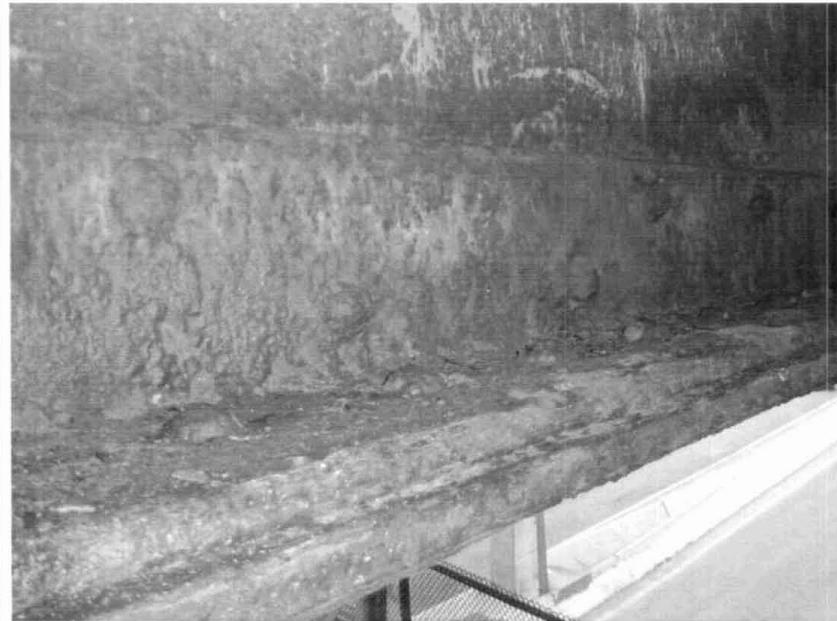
Heavy rust with section loss in the bottom flange angle and cover plate of the steel pier cap (pier 1).
